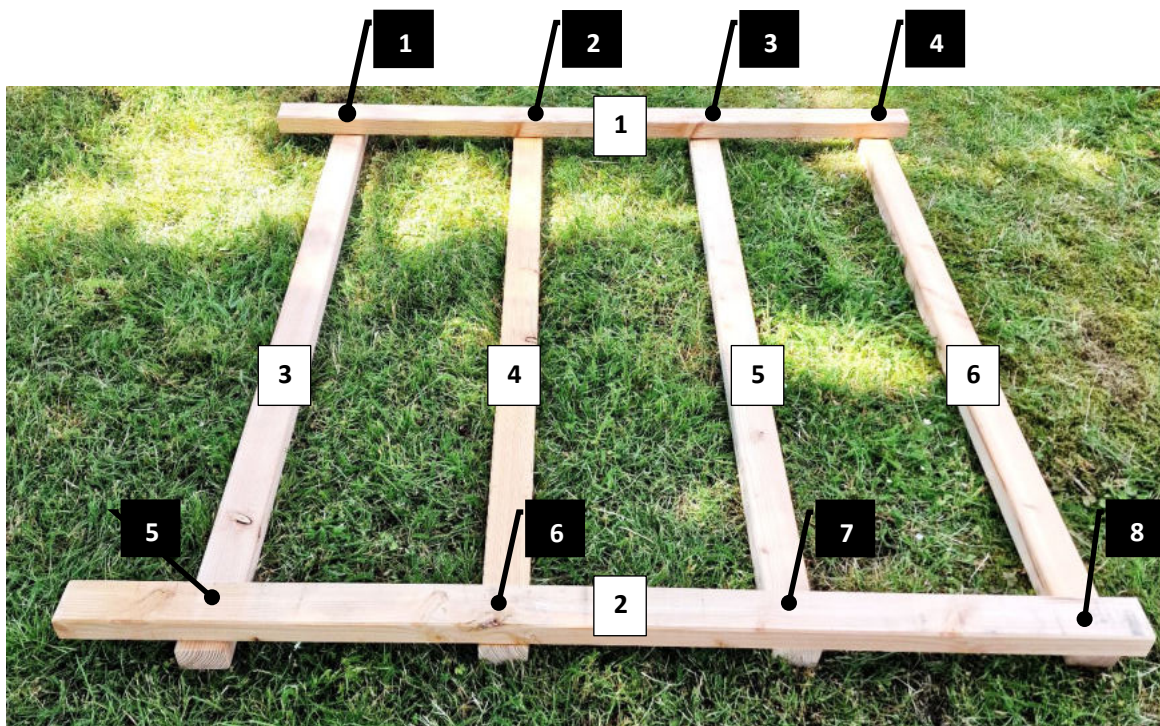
Assembly of the back frame using the wooden beams (1-6) and the screws (position 1-8).
